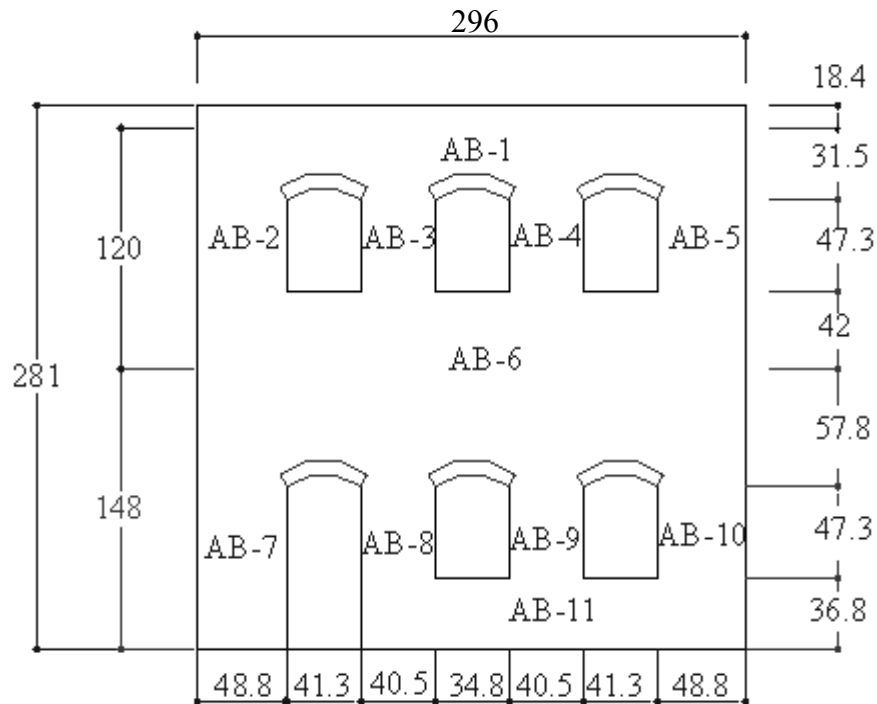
Elevation view of Walls A and B (dimensions are in inches).
